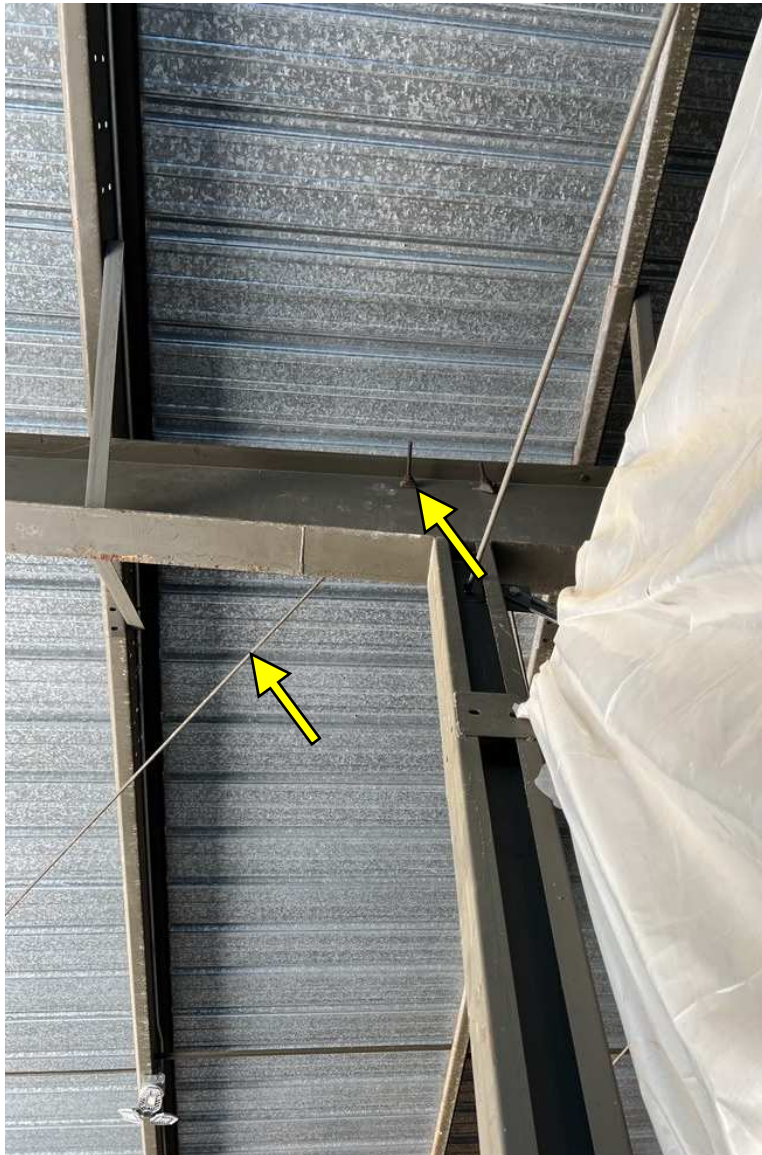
IMG\_5235 – Building 2, Unit 10 – Exemplar photograph of sharp angle created between diaphragm bracing connection and brace line.
